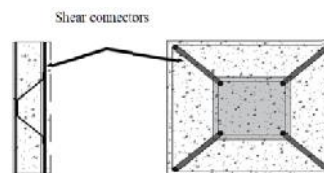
Profile of shear connectors between original column and jacket reinforcement.
